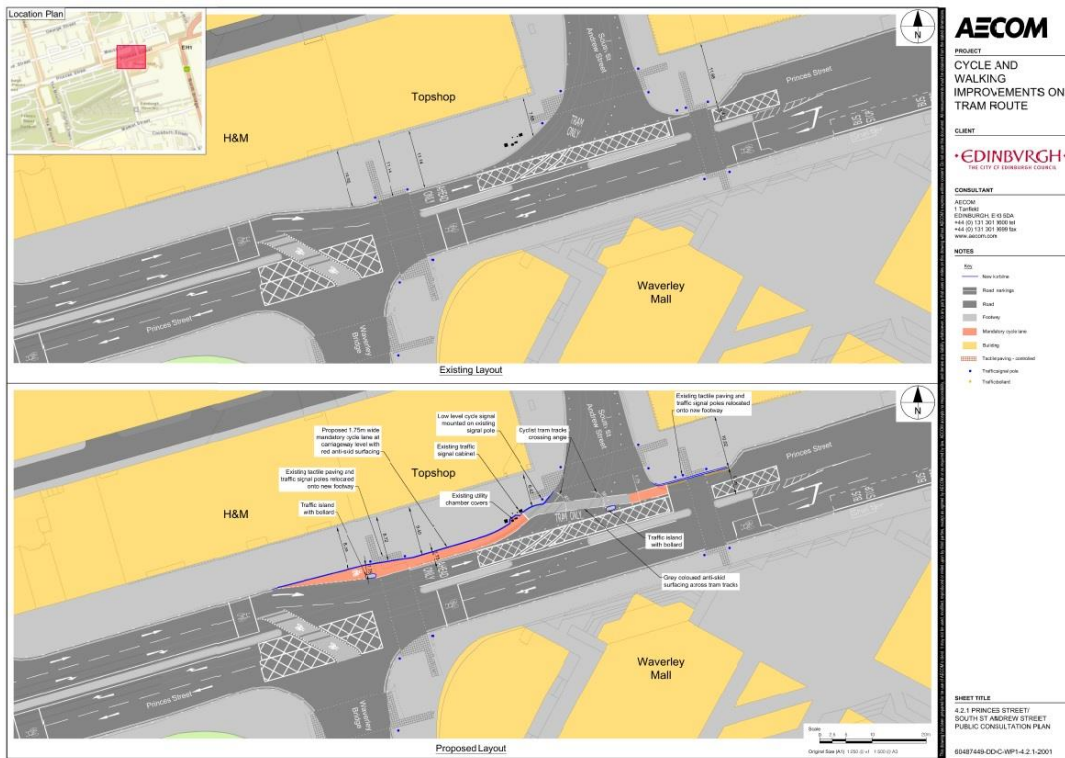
Princes Street / South St Andrew Street (1 of 8)
